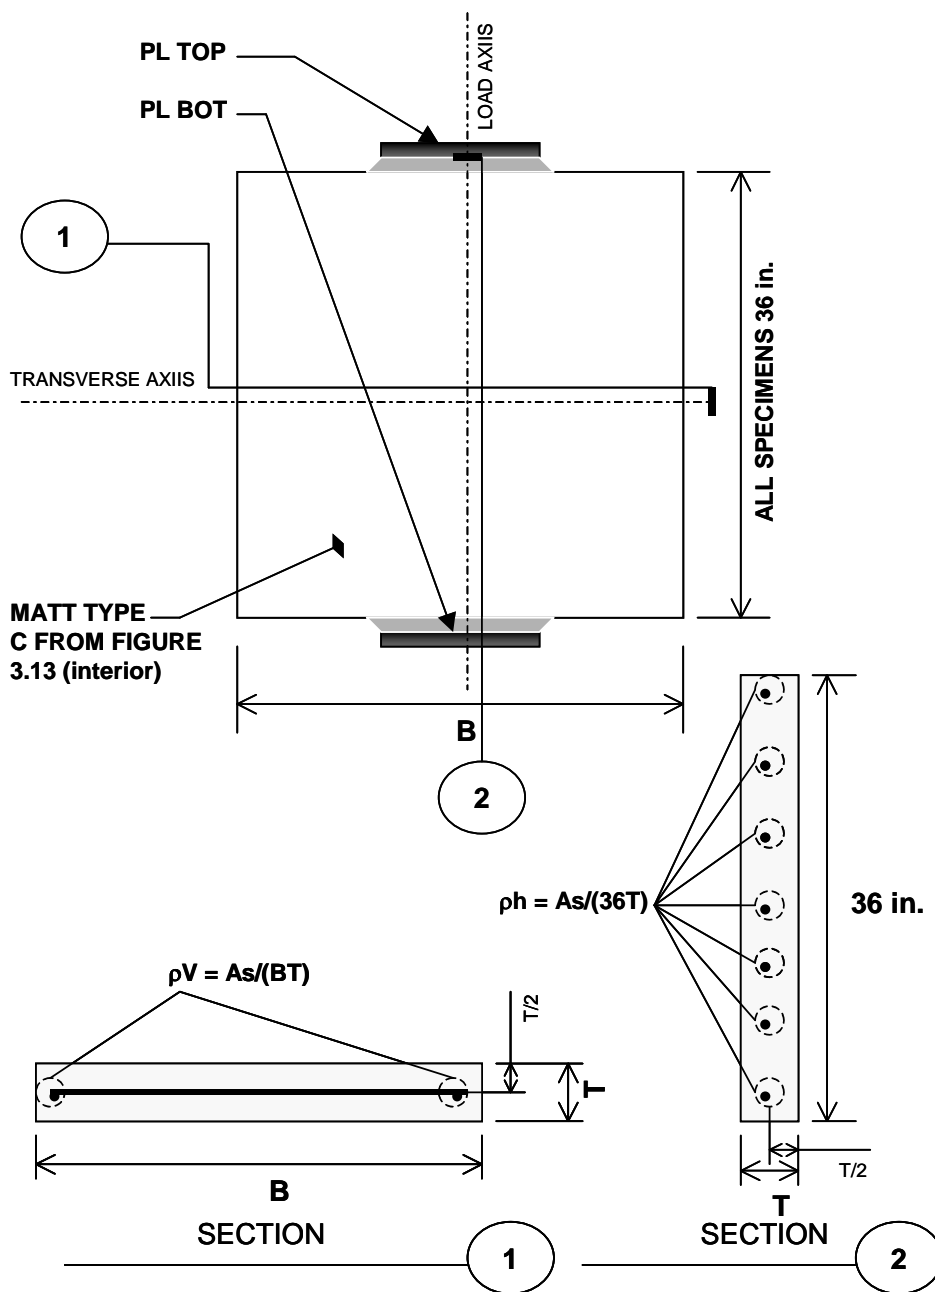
Typical Specimen Elevation for Use with Table 3.1
